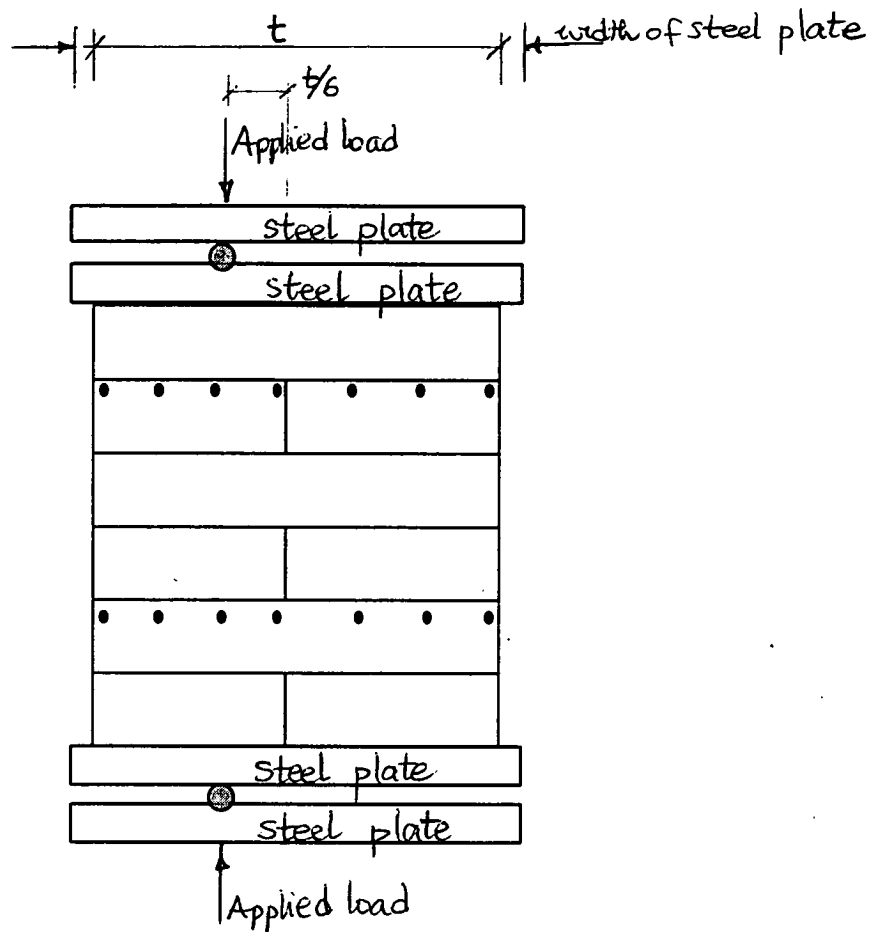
(b) : Test Set-Up for Eccentrically-loaded Prism Specimen
